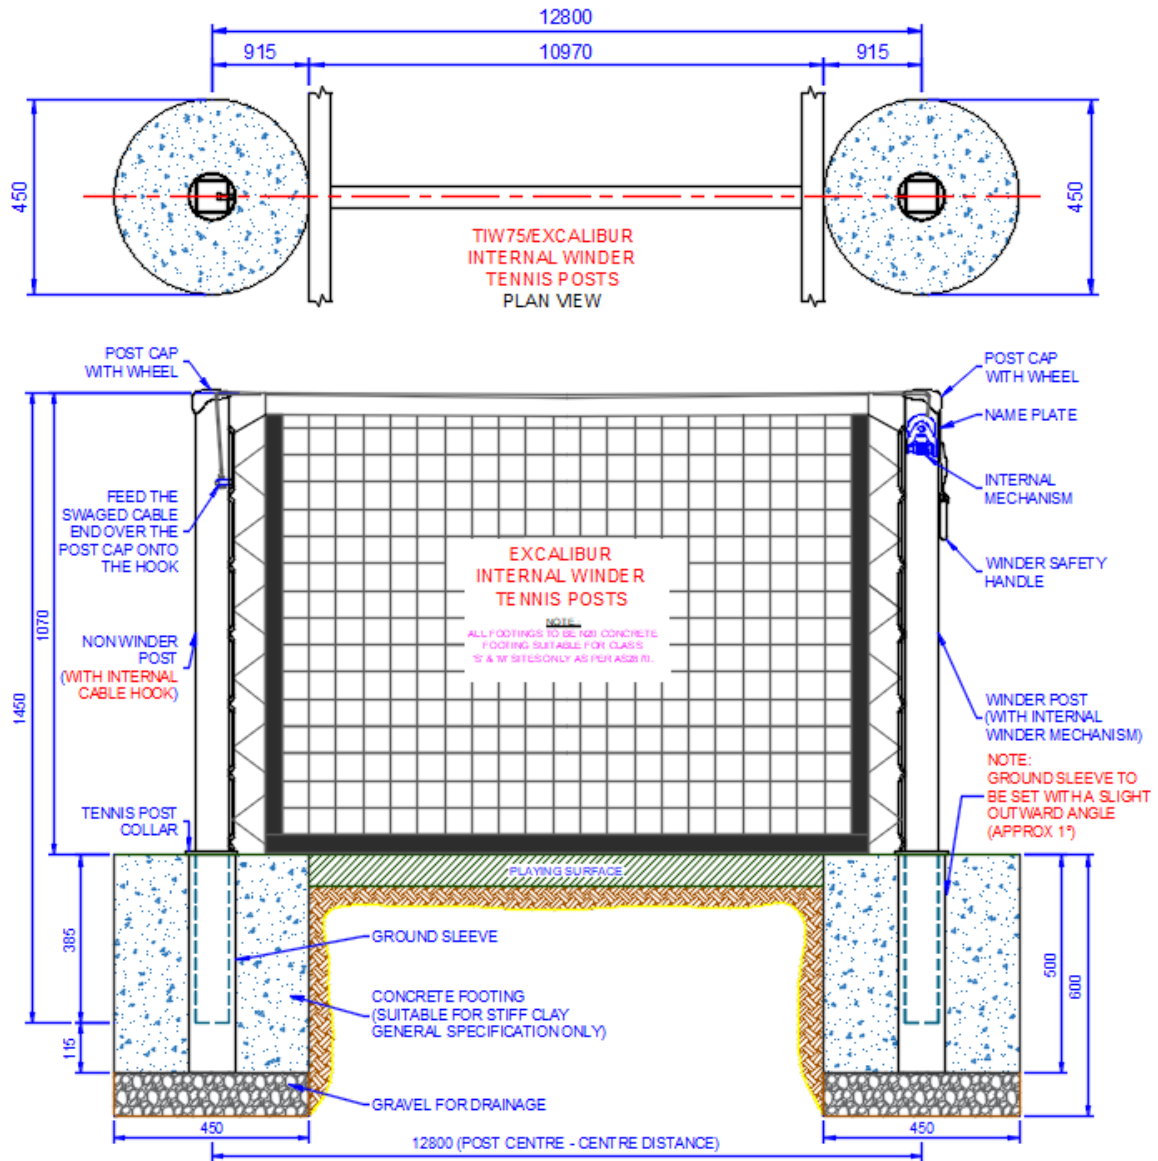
Excalibur/TIW75 Footing & Assembly Details
